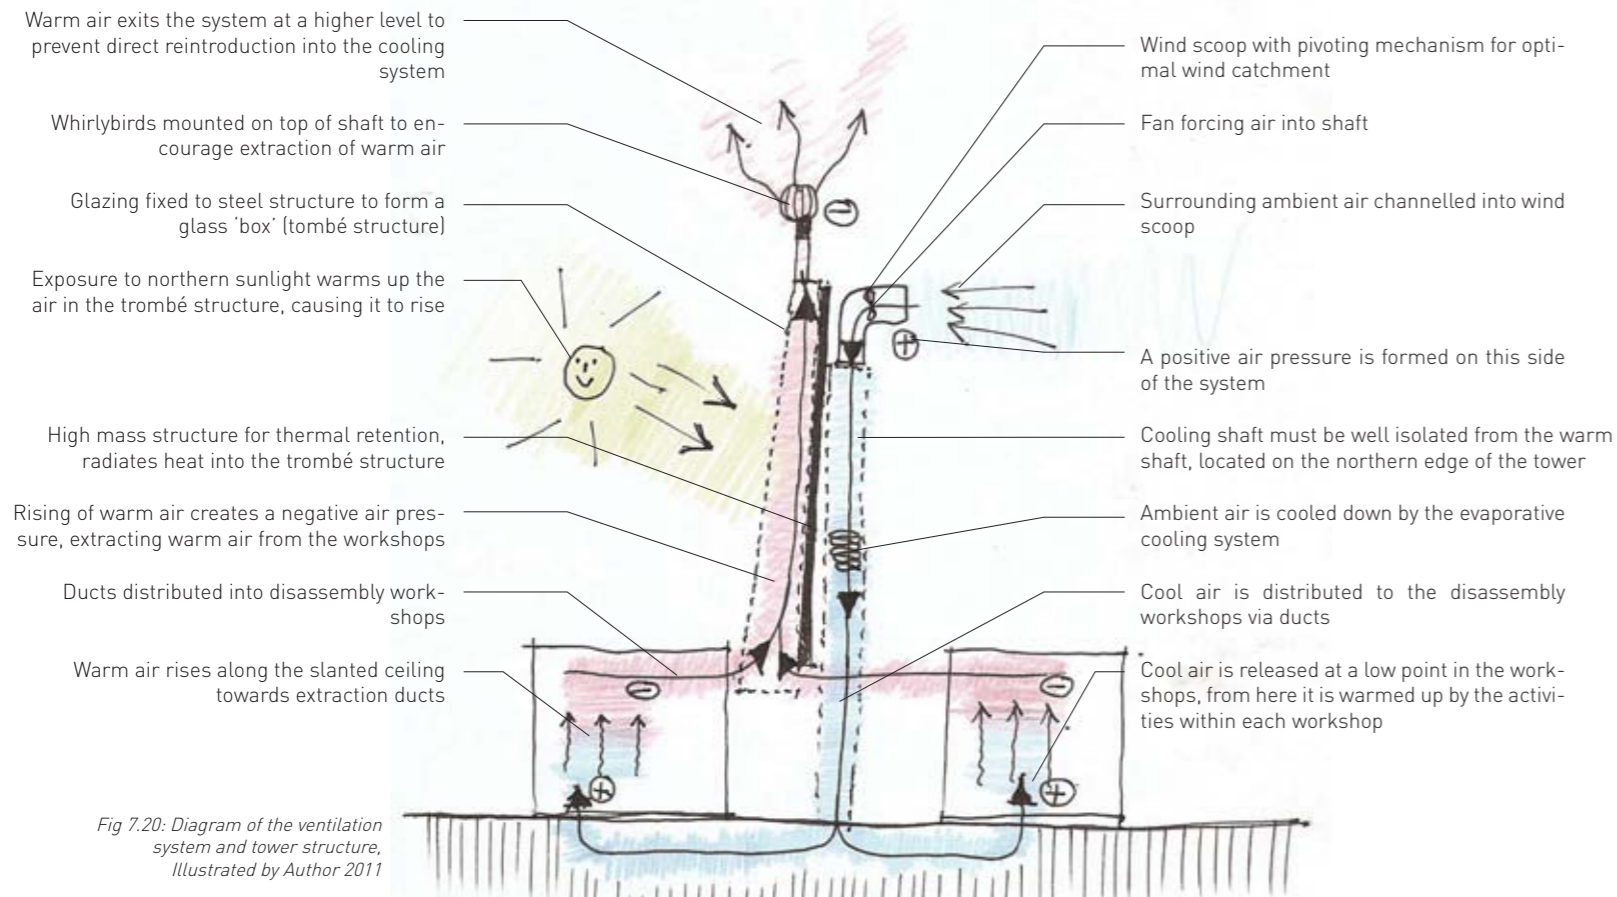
Diagram of the ventilation system and tower structure, Illustrated by Author 2011
